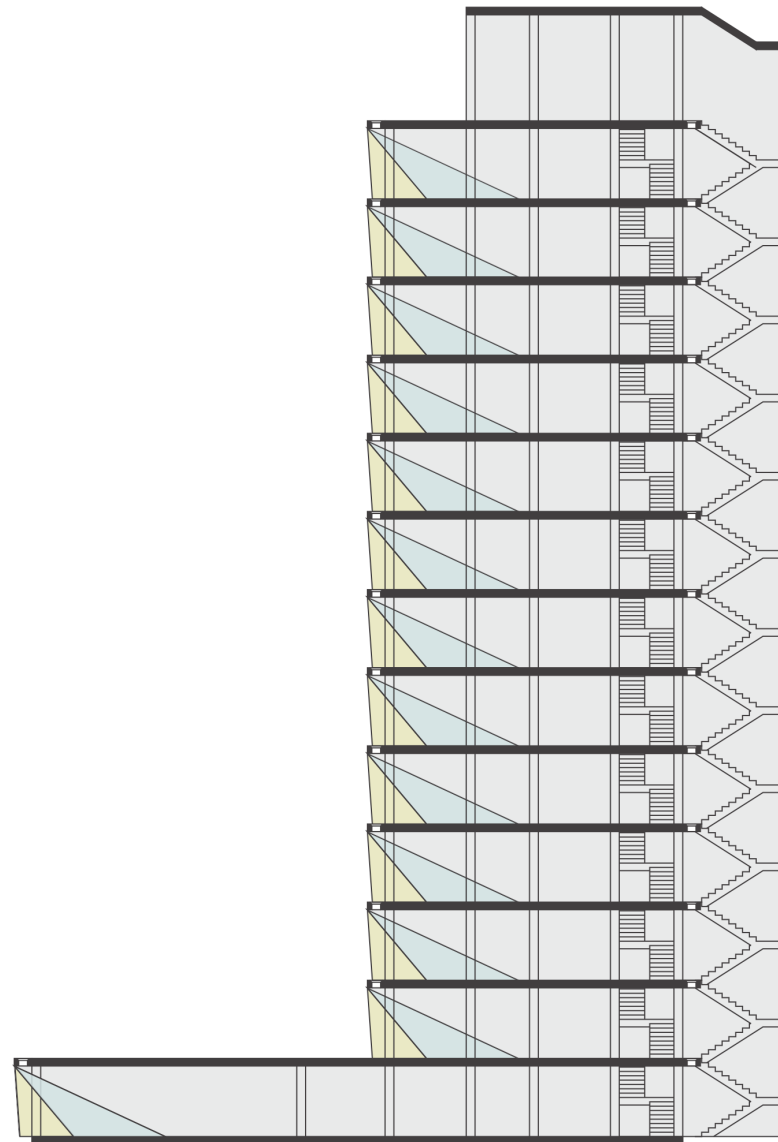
Section of building indicating sun angles and efficacy of brise soleil
